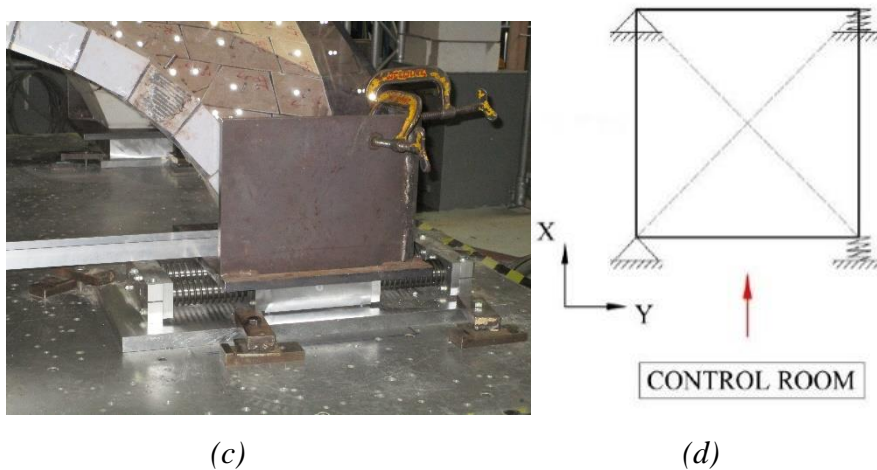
(c) Steel plates mounted on a moveable carriage running on bearings controlled by horizontal springing to realize two flexible springings. (d) Scheme of Configuration 2: moveable.
